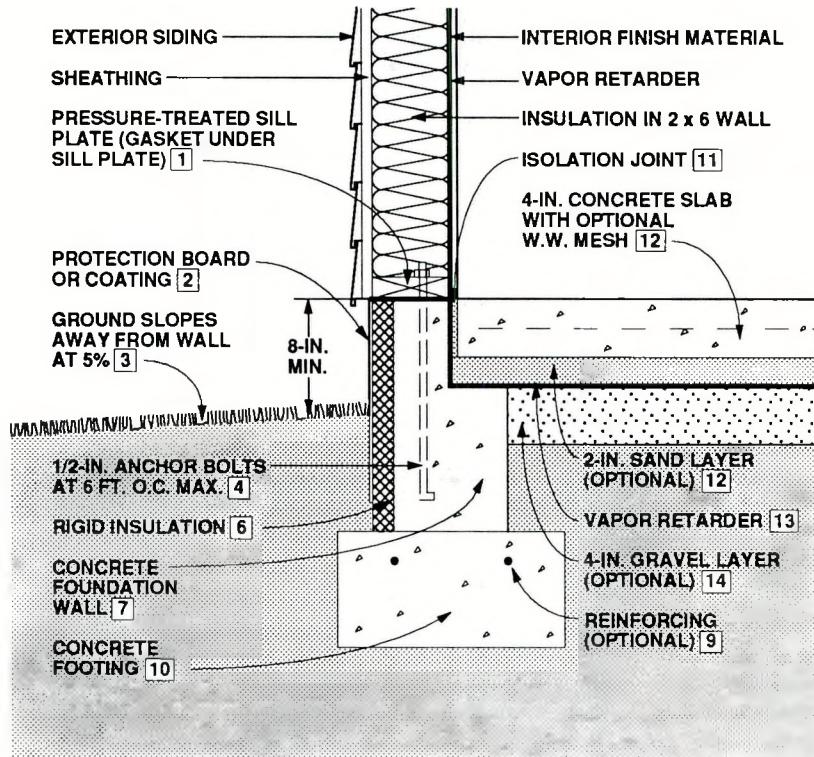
Slab-on-Grade with Concrete Wall (Exterior Insulation)
